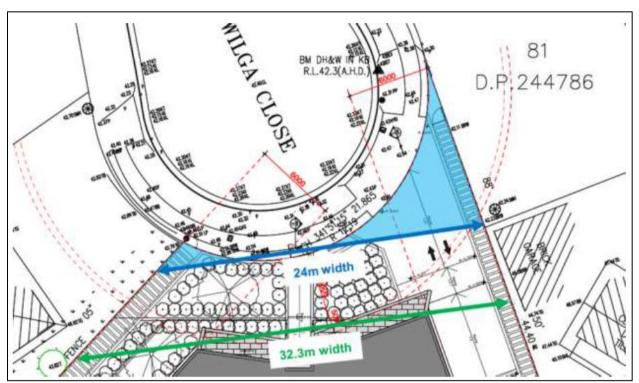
Frontage dimensions showing where a 24m width is as well as the width at the building line.
